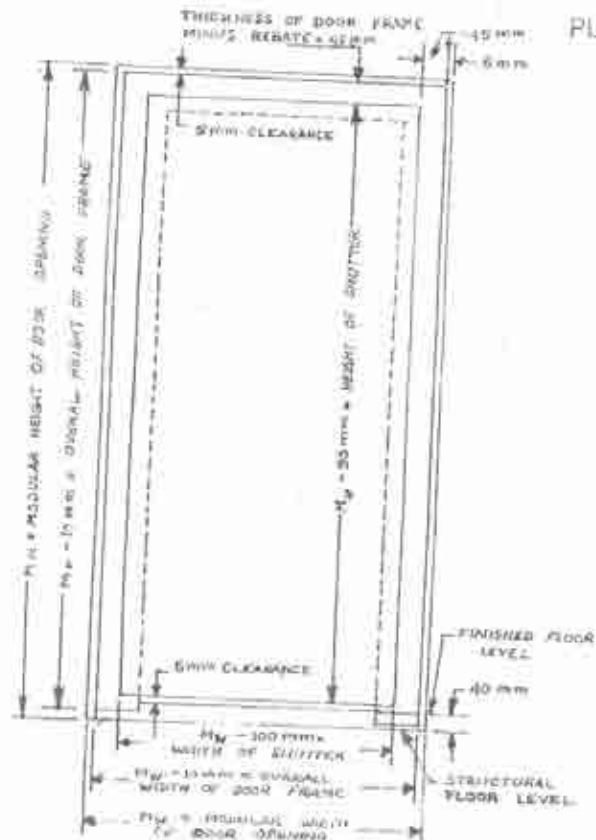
SKETCH ILLUSTRATING DIMENSIONS OF SHUTTER
